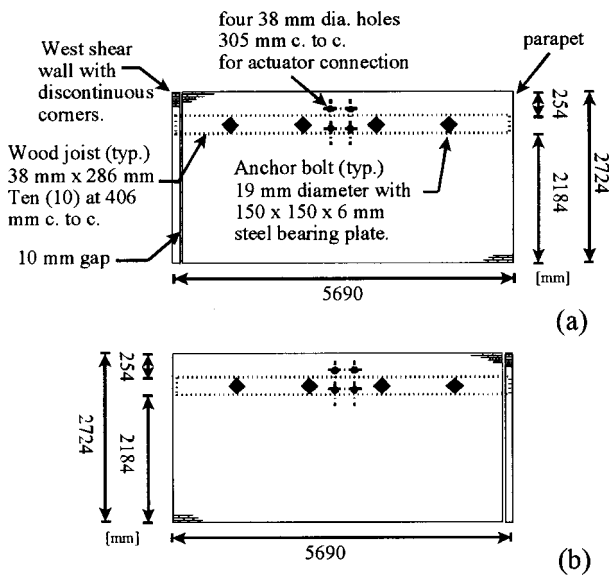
Elevation of URM specimen (normal to loading): (a) south wall and (b) north wall
